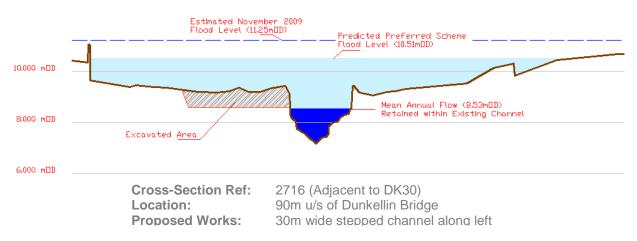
Proposed Works Channel Works from Dunkellin Bridge to Rinn Bridge
